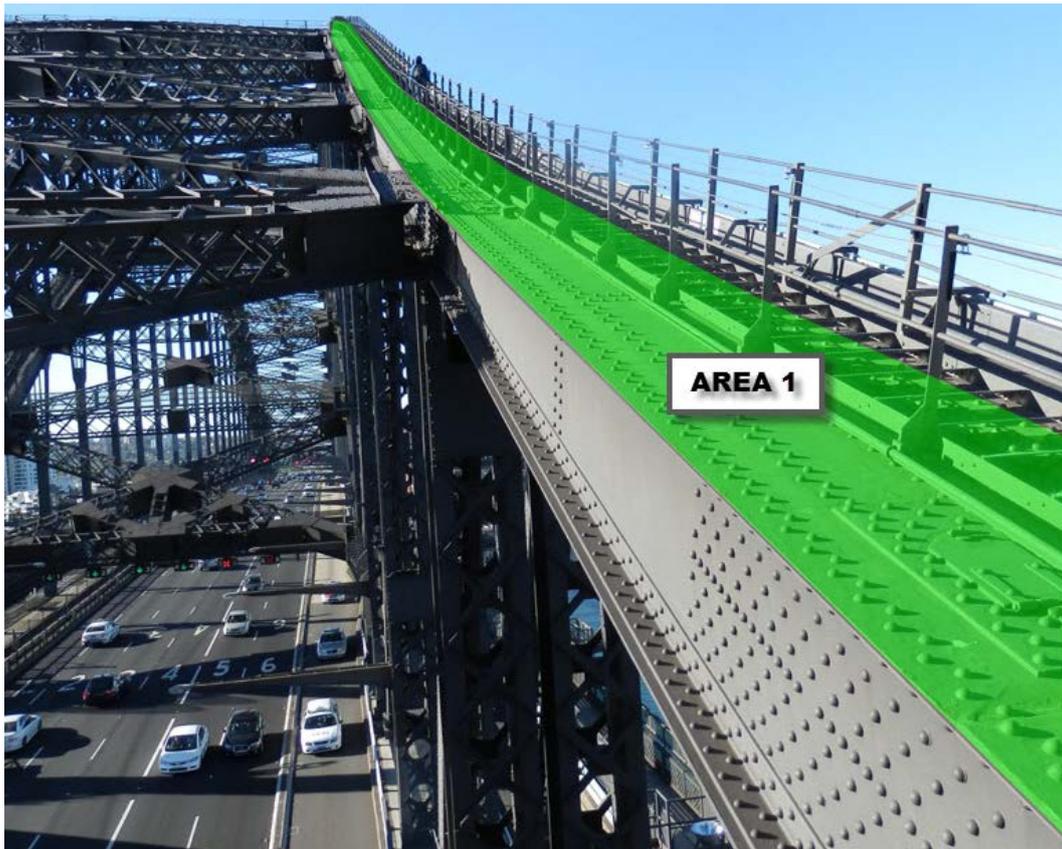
Nominated area 1 for detail survey and modelling (highlighted in green).
